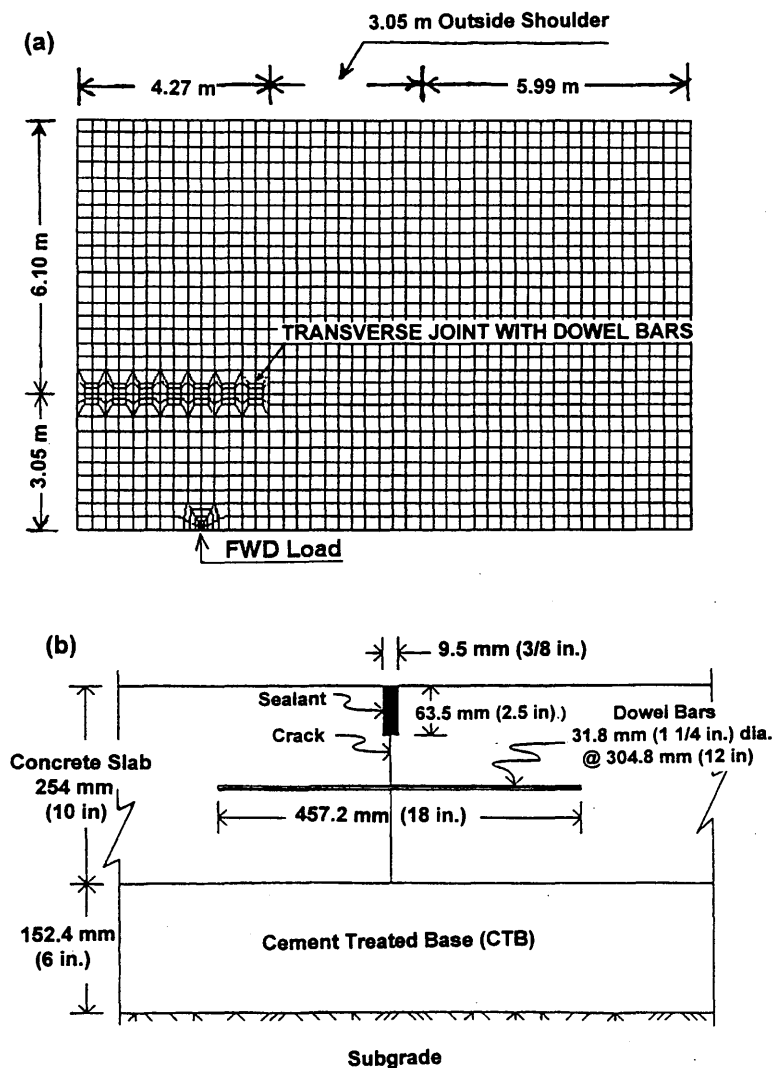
(a) Plan view of finite-element mesh and (b) cross section of transverse joint.
